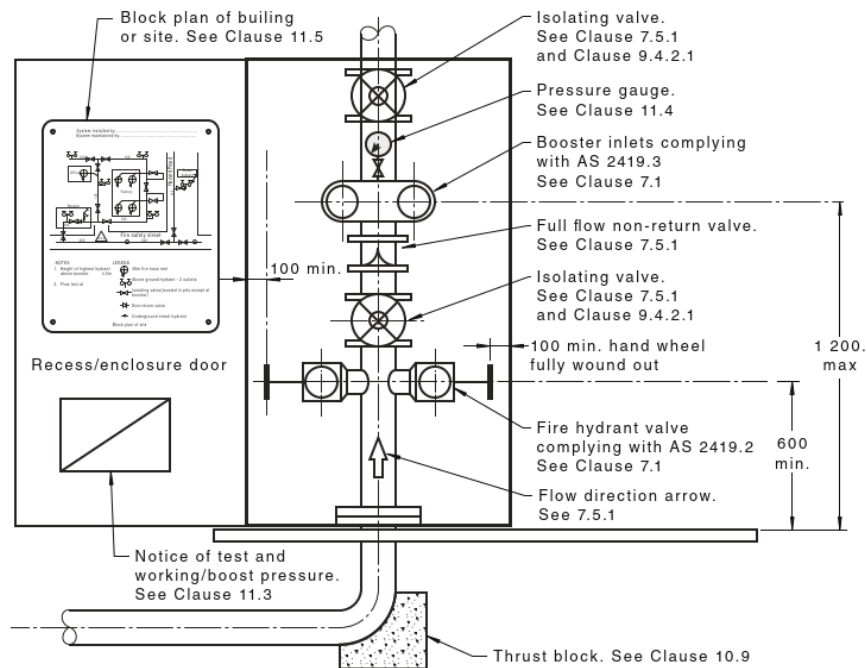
Typical I-Pattern Fire Brigade Booster Assembly Arrangement (as detailed within AS2419.1)
